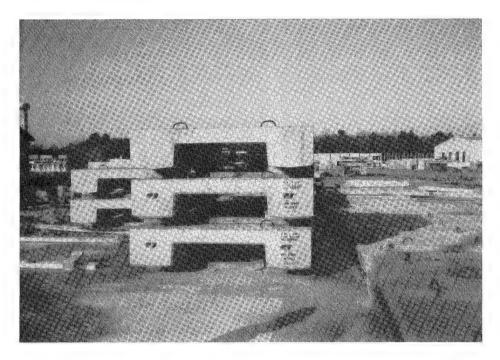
Panel storage in precast plant yard, Troy Lock (from Miles 1993)
